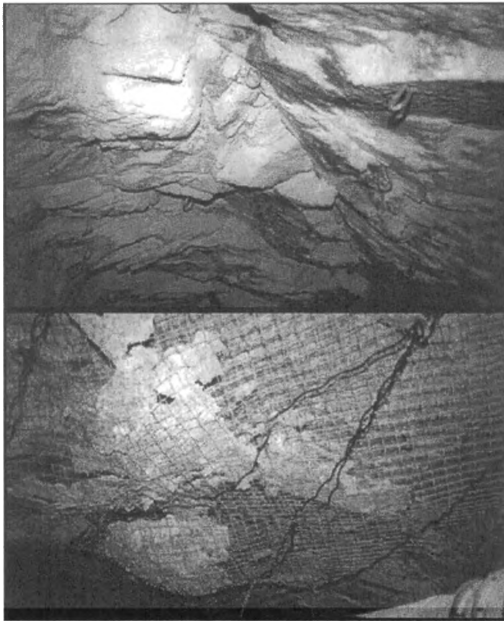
Problems with supporting key blocks and preventing hangingwall rock falls.
